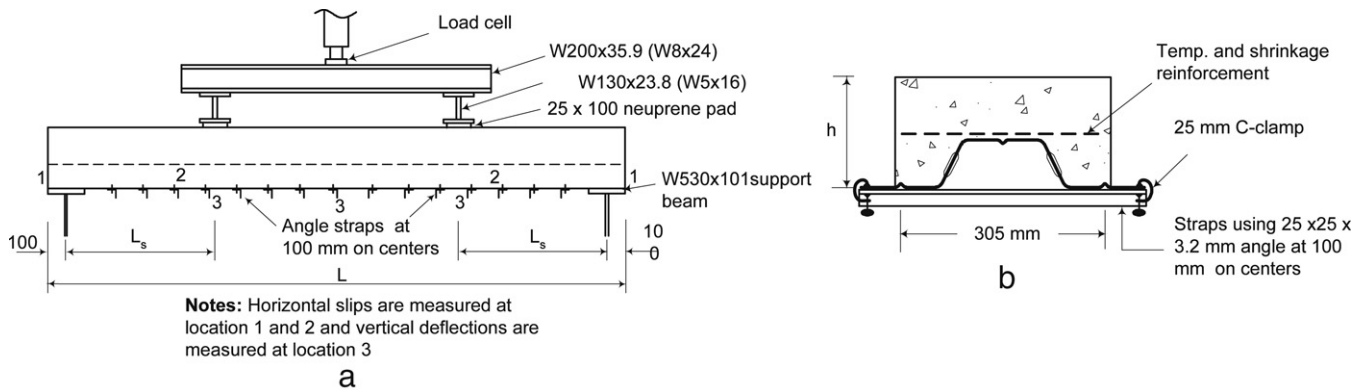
Small scale bending test (a) Elevation, (b) Cross section.
